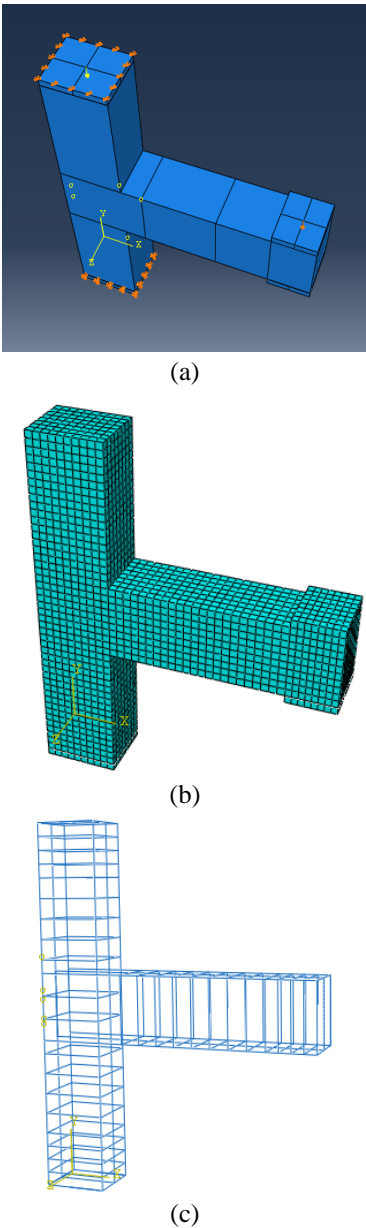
(a) Applied loads and boundary condition; (b) Concrete elements and meshing and (c) Steel reinforcing rebars elements
